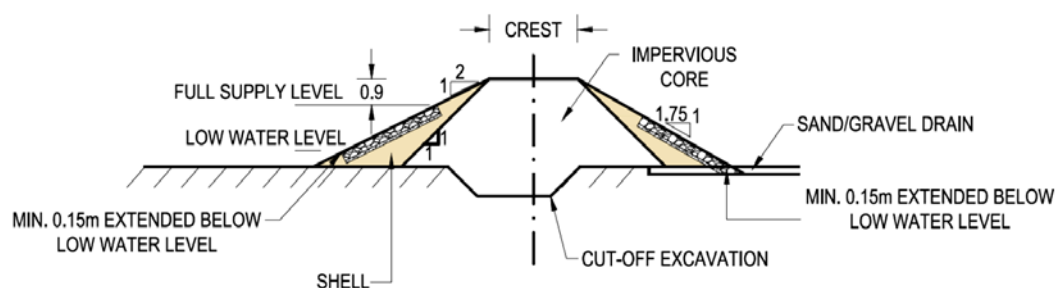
(b): Typical Cross-Section Zoned Dam
